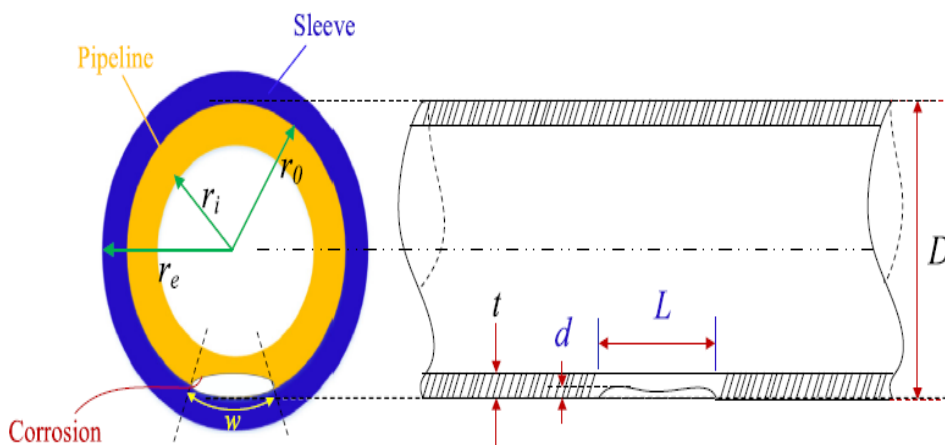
Composite structure of corroded pipeline repaired by sleeve [170].
